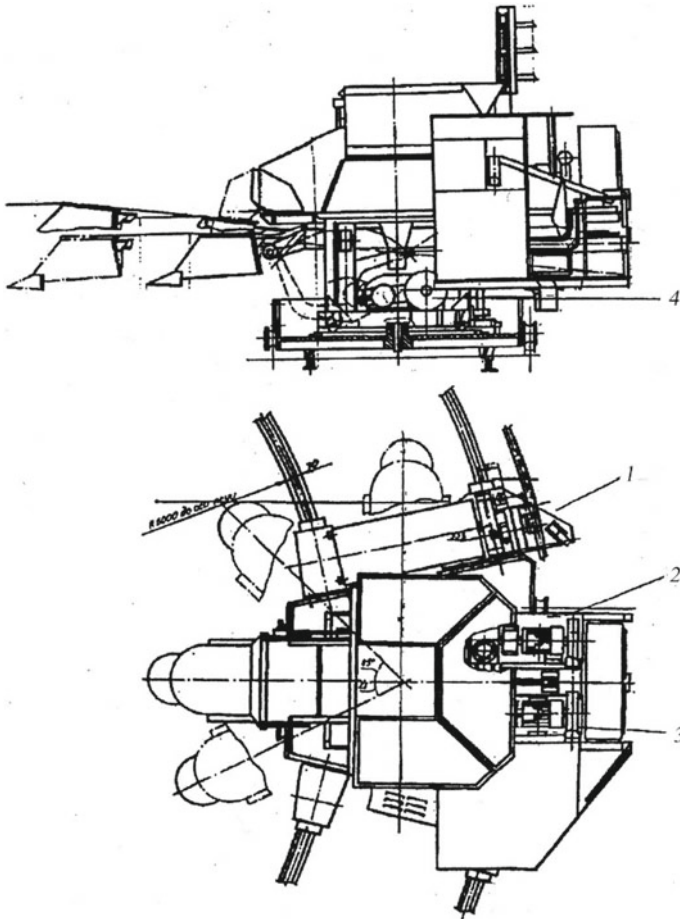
Filling machine FP-1 M, 1—movement mechanism; 2—rotation mechanism; 3—loading mechanism; 4—throw mechanism
